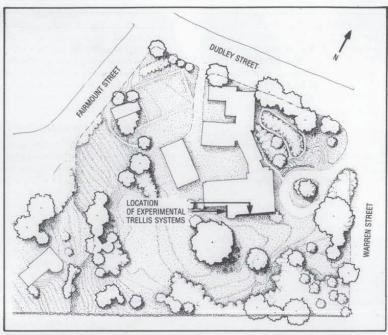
Site plan of Fairsted; the experimental trellis systems were installed on the south and west elevations. Drawing by Karen Day.
